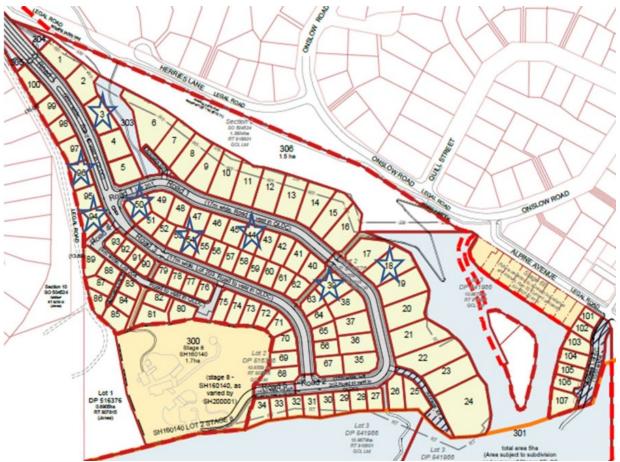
Location of the proposed dwellings within the approved subdivision (source: AEE & RM120243)
